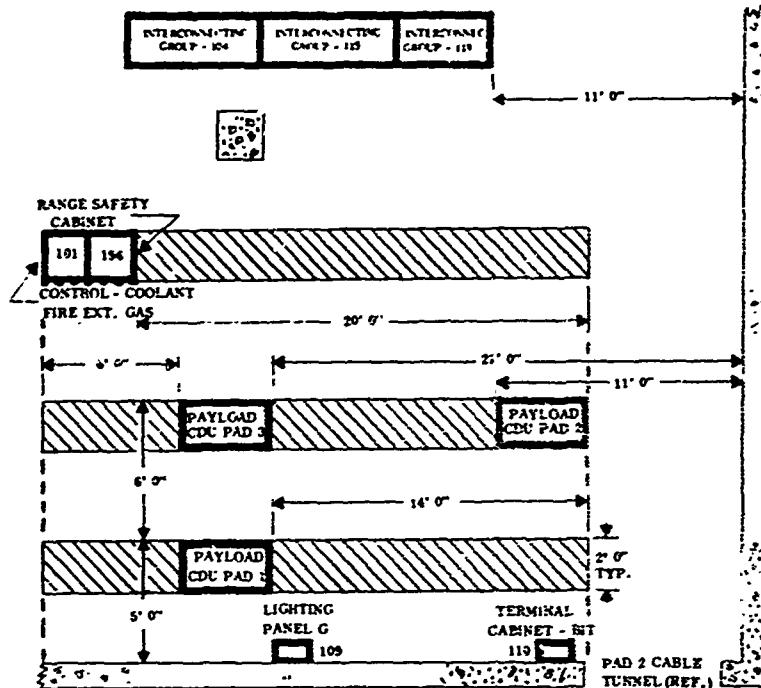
Space Provisions for Payload Equipment in LOB Basement
